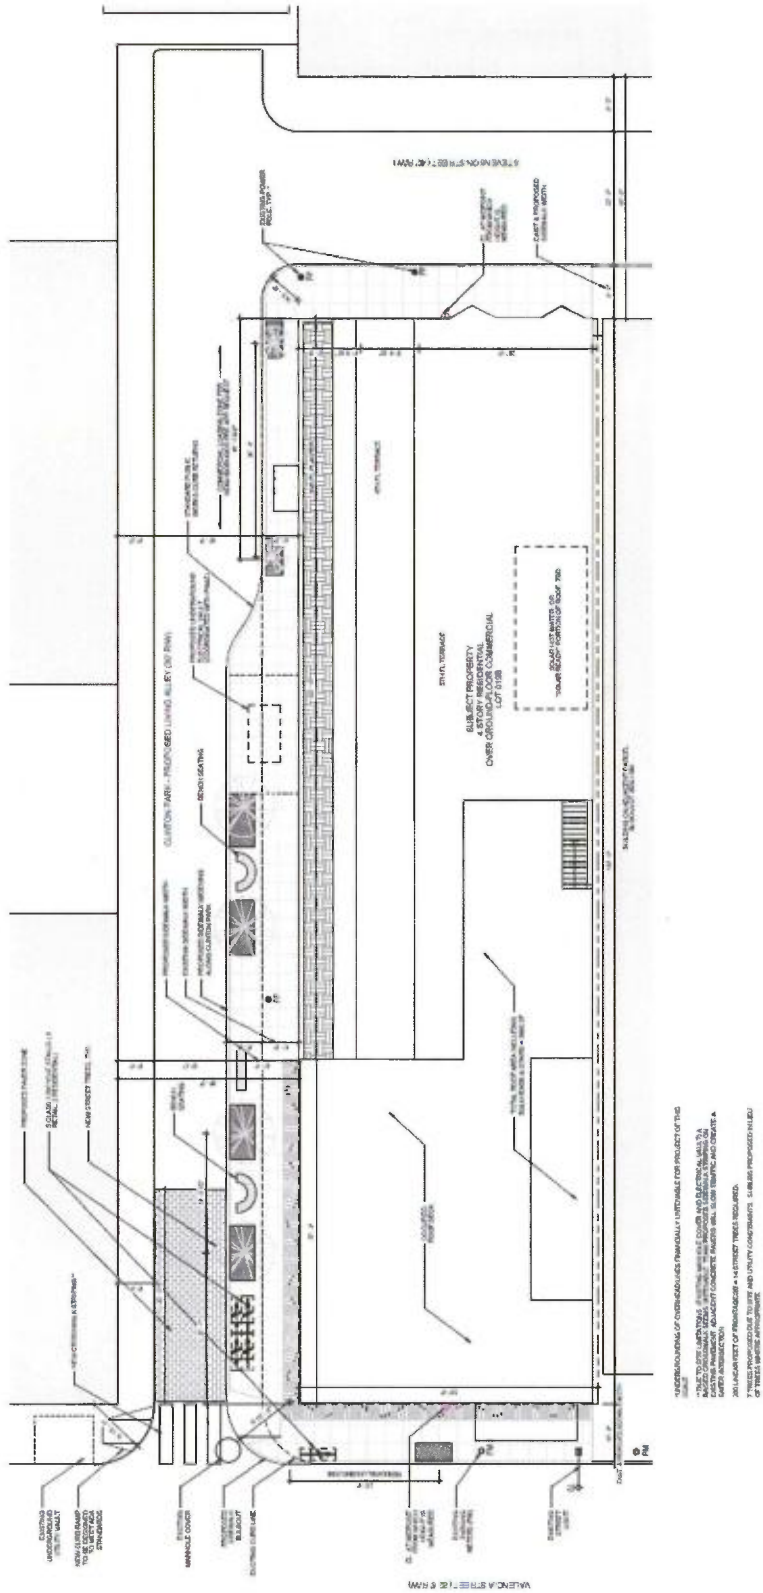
Proposed plot plan (Source: Heller Manus Architects)
